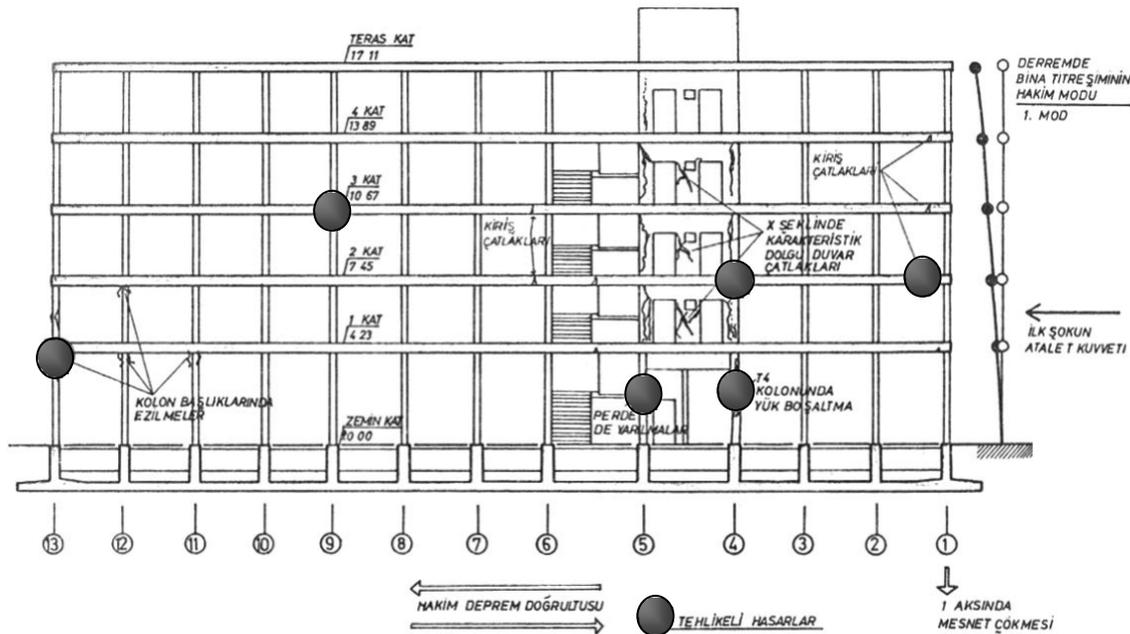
Damage pattern of the Adapazari City Hall Building after the 1967 Akyazi earthquake [4]
